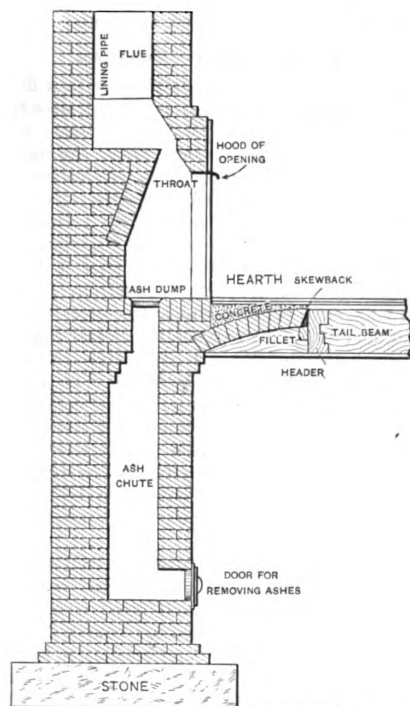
Vertical Section of a Properly Built Hearth and Chimney.
